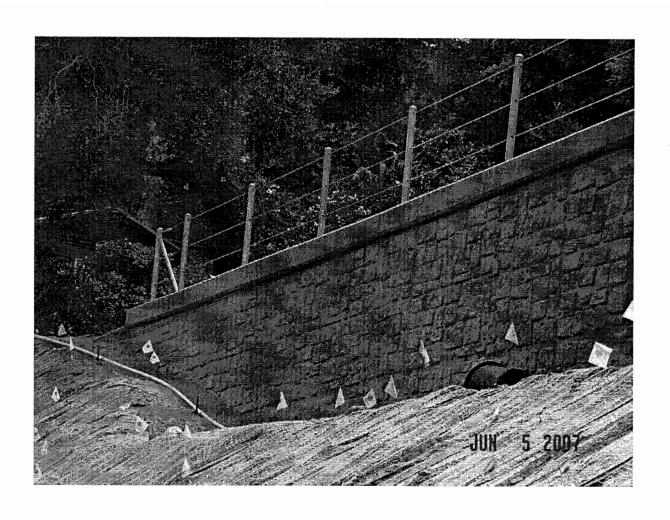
4-09-054 (LACDPW) Wall Façade Example
